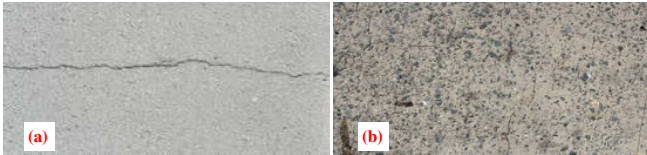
(a) Crack on an asphalt surface. The crack is very distinct from the background. (b) Cracks on a concrete bridge deck surface. The cracks are surrounded by image clutter.
